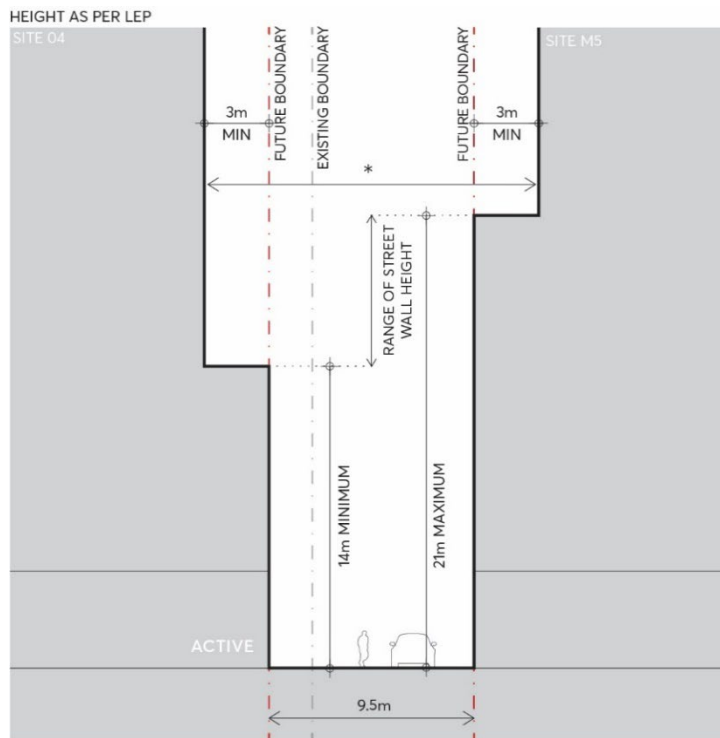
Future Horwood Place (Section C) Setbacks & Street Wall Height
